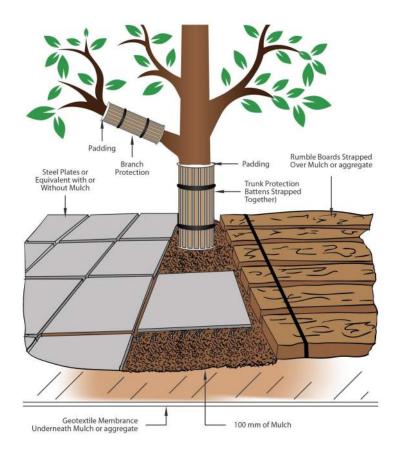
Details of trunk, branch and ground protection. (Standards Australia, 2009)
